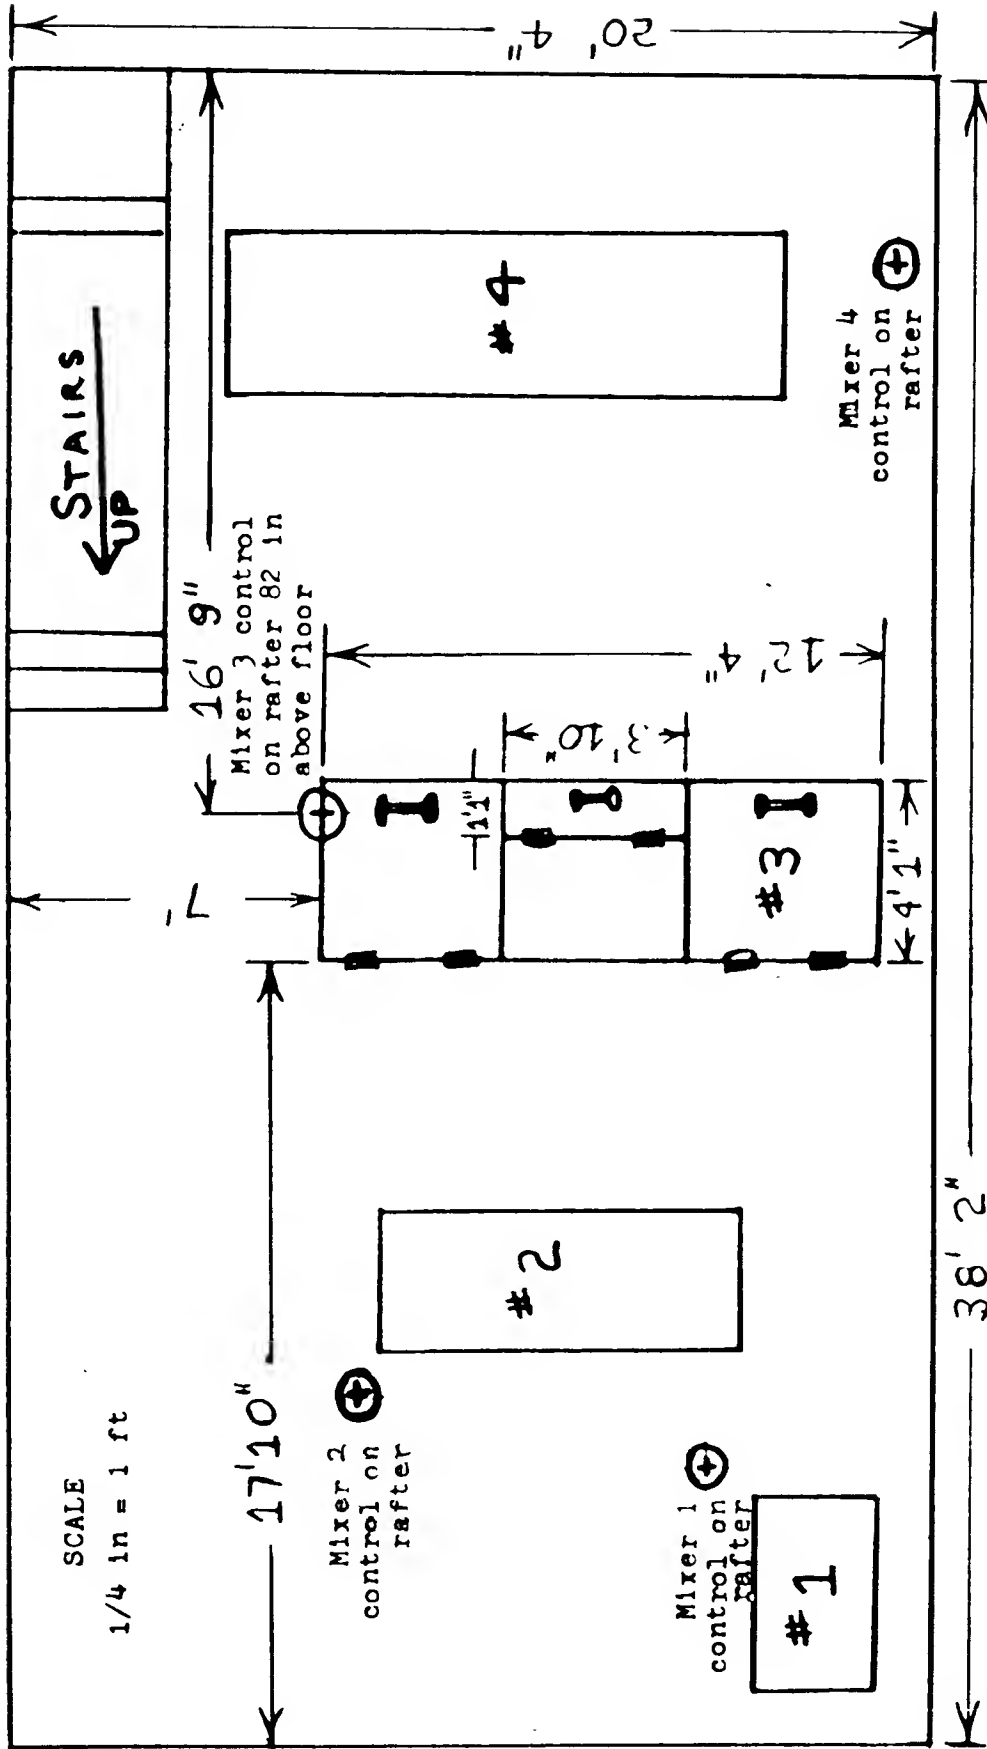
Layout of floor plan of balcony in mixer area of mill
